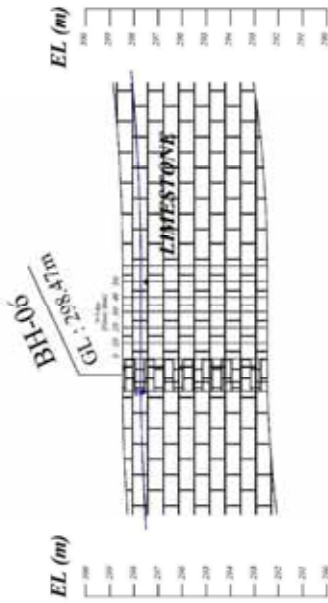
Soil profile for BH-06 (Pamumchaung Side)
